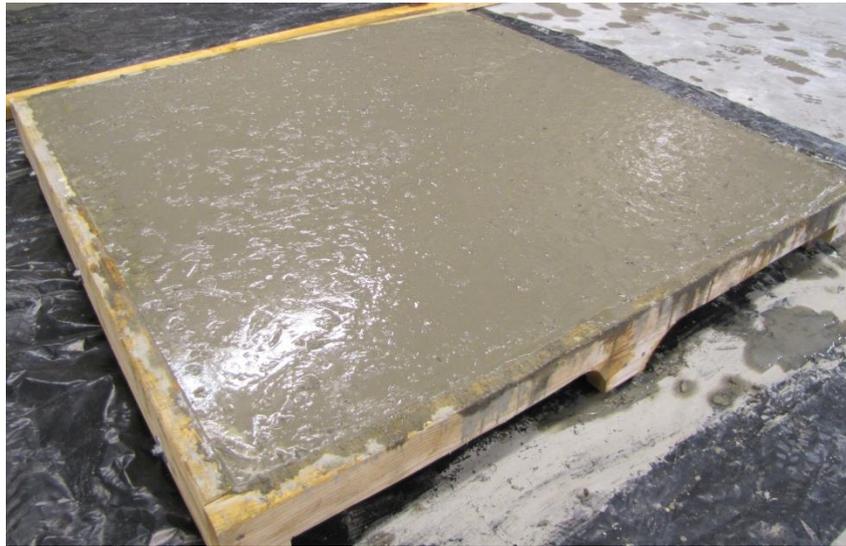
Completed LCFRC Impact Panel In Formwork
